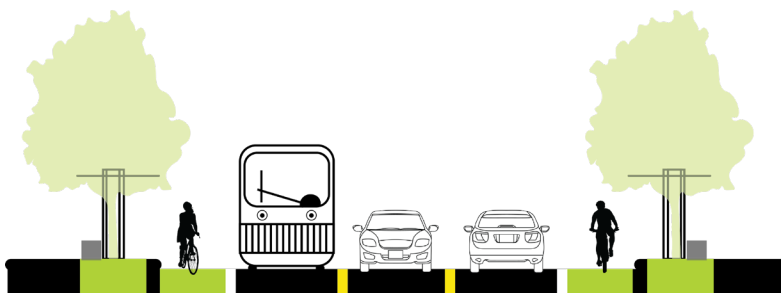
Section B - Mixed-Use Oriented Streetscape on Prospect Avenue
